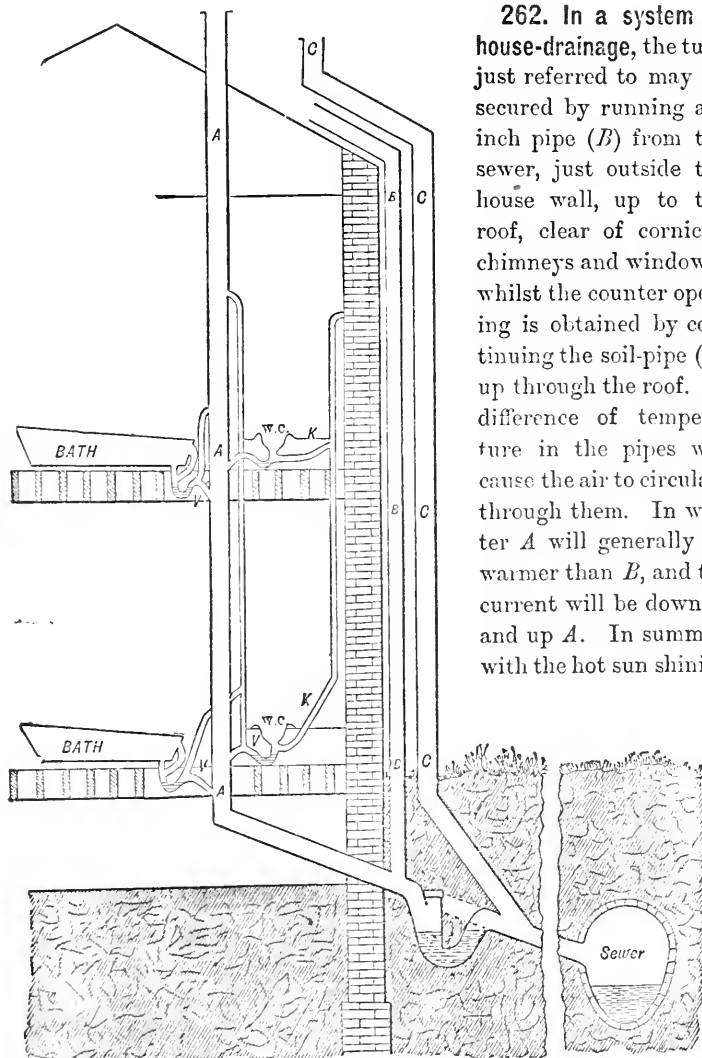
Section showing an efficient system of house drainage and drain ventilation.
